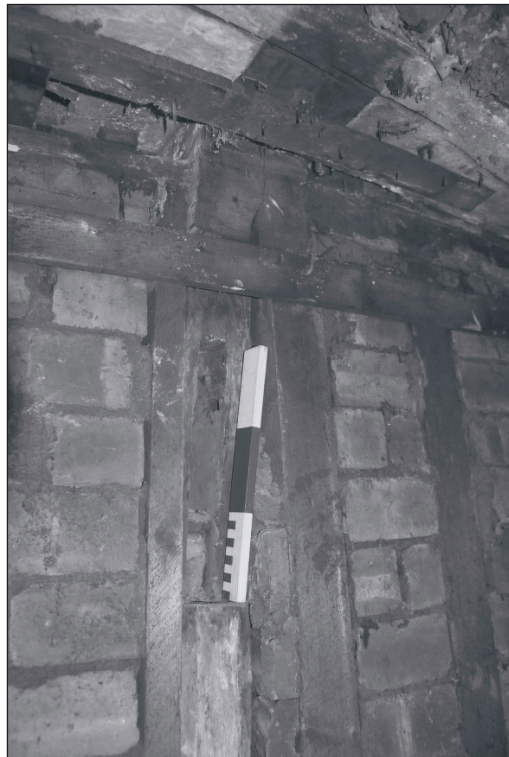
Detail of mortice holes within the exposed timber post to the north of G4, Building 2 (Film 30.23)
